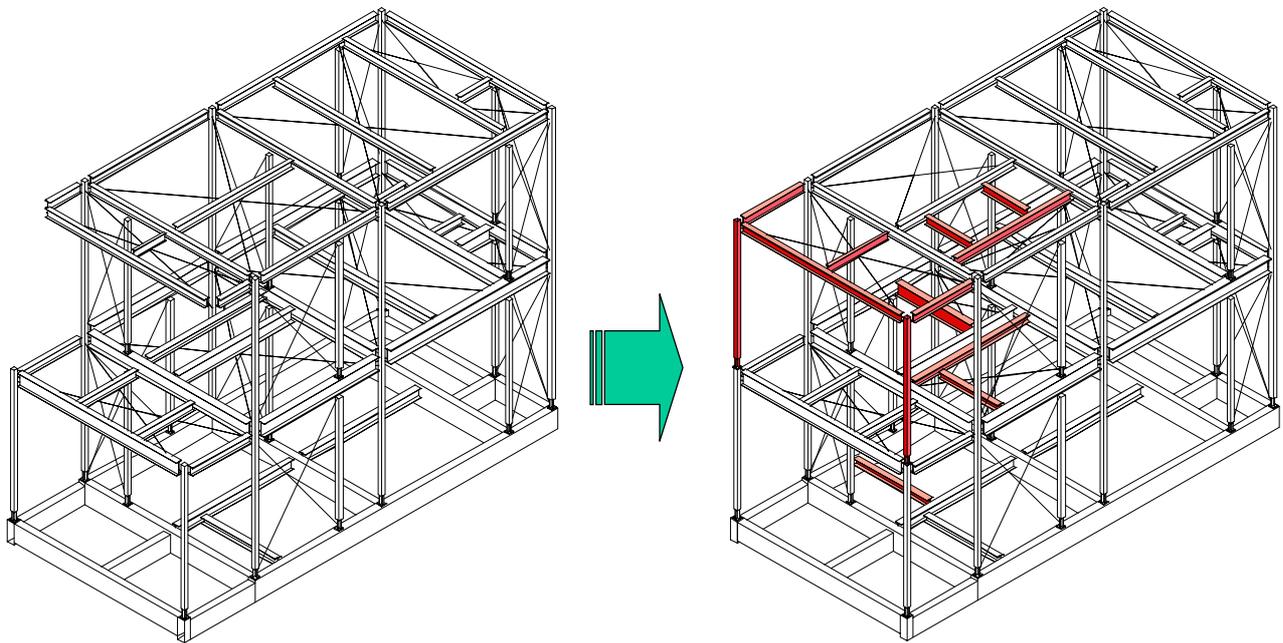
Renovation plan for the dwelling unit (52.5m<sup>2</sup> in area) and exterior
